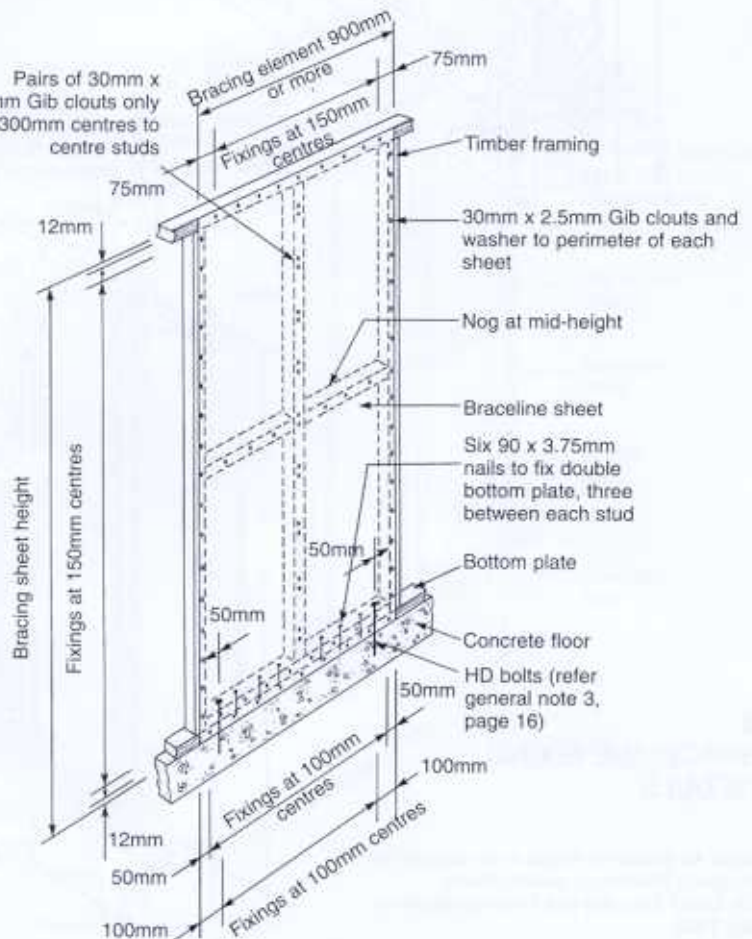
HARDITEX™ / BRACELINE GROUP NAILING DETAIL ON CONCRETE FLOOR (System HT12B)
